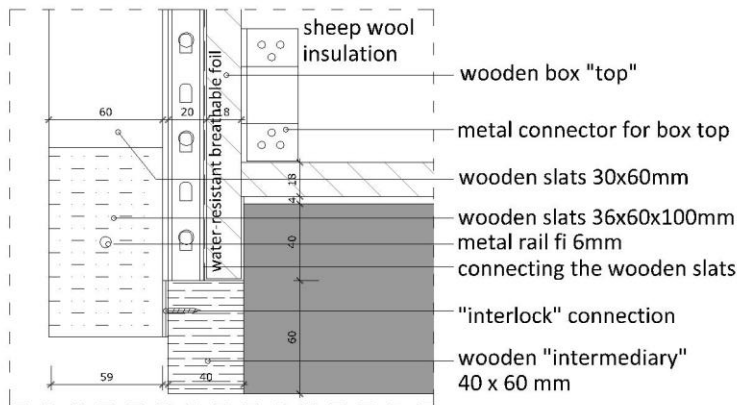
Details and sections of the GDC external wall finishing (detail of wooden slats facade). (source: 4D architects).
